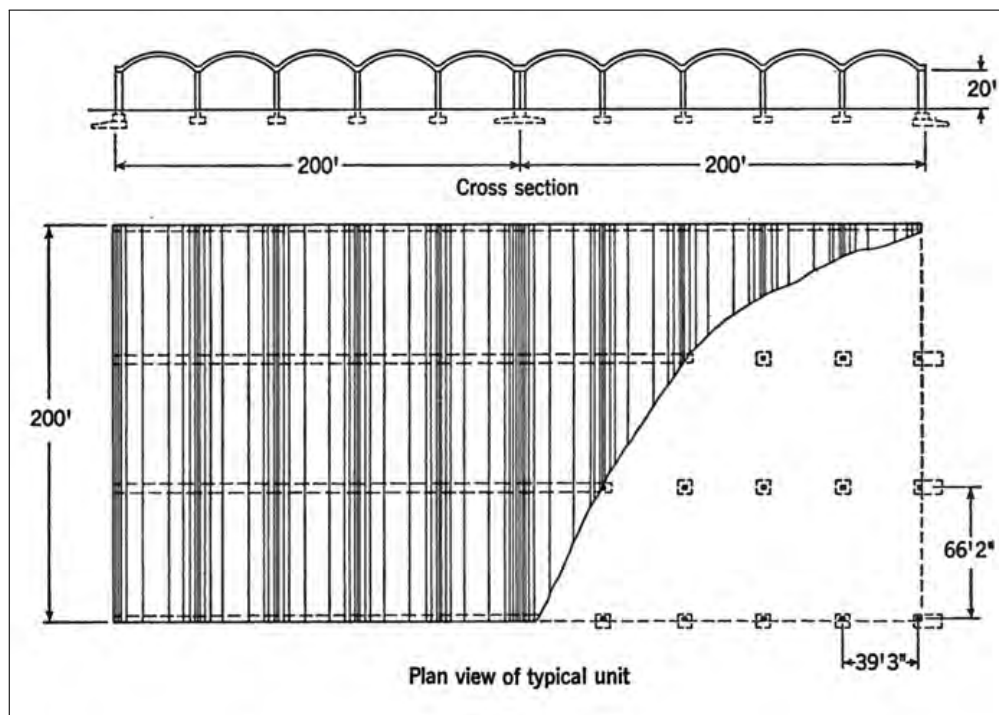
Pennsylvania Warehouse Roof Layout, (Billington, 1965)
